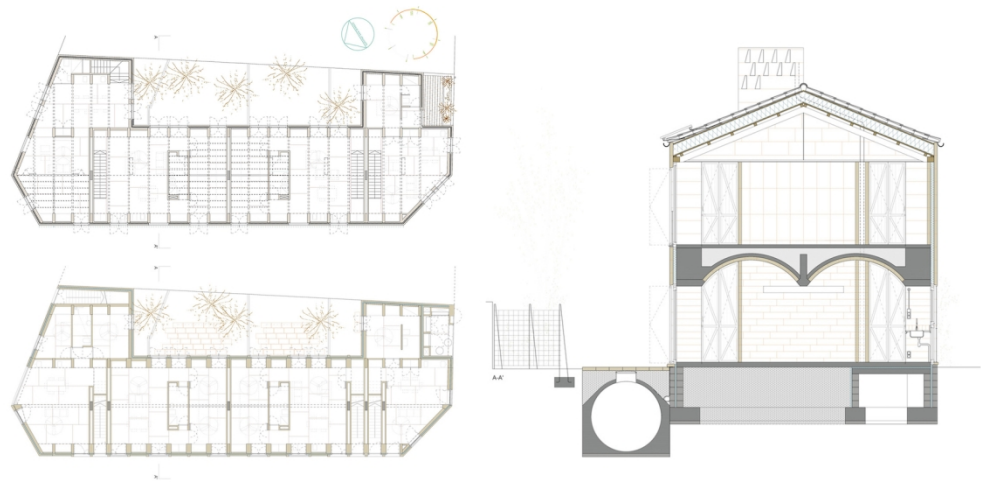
IBAVI, Social Housing in Palma de Mallorca, 2021. Floor plans and cross section. (Credit: IBAVI)
